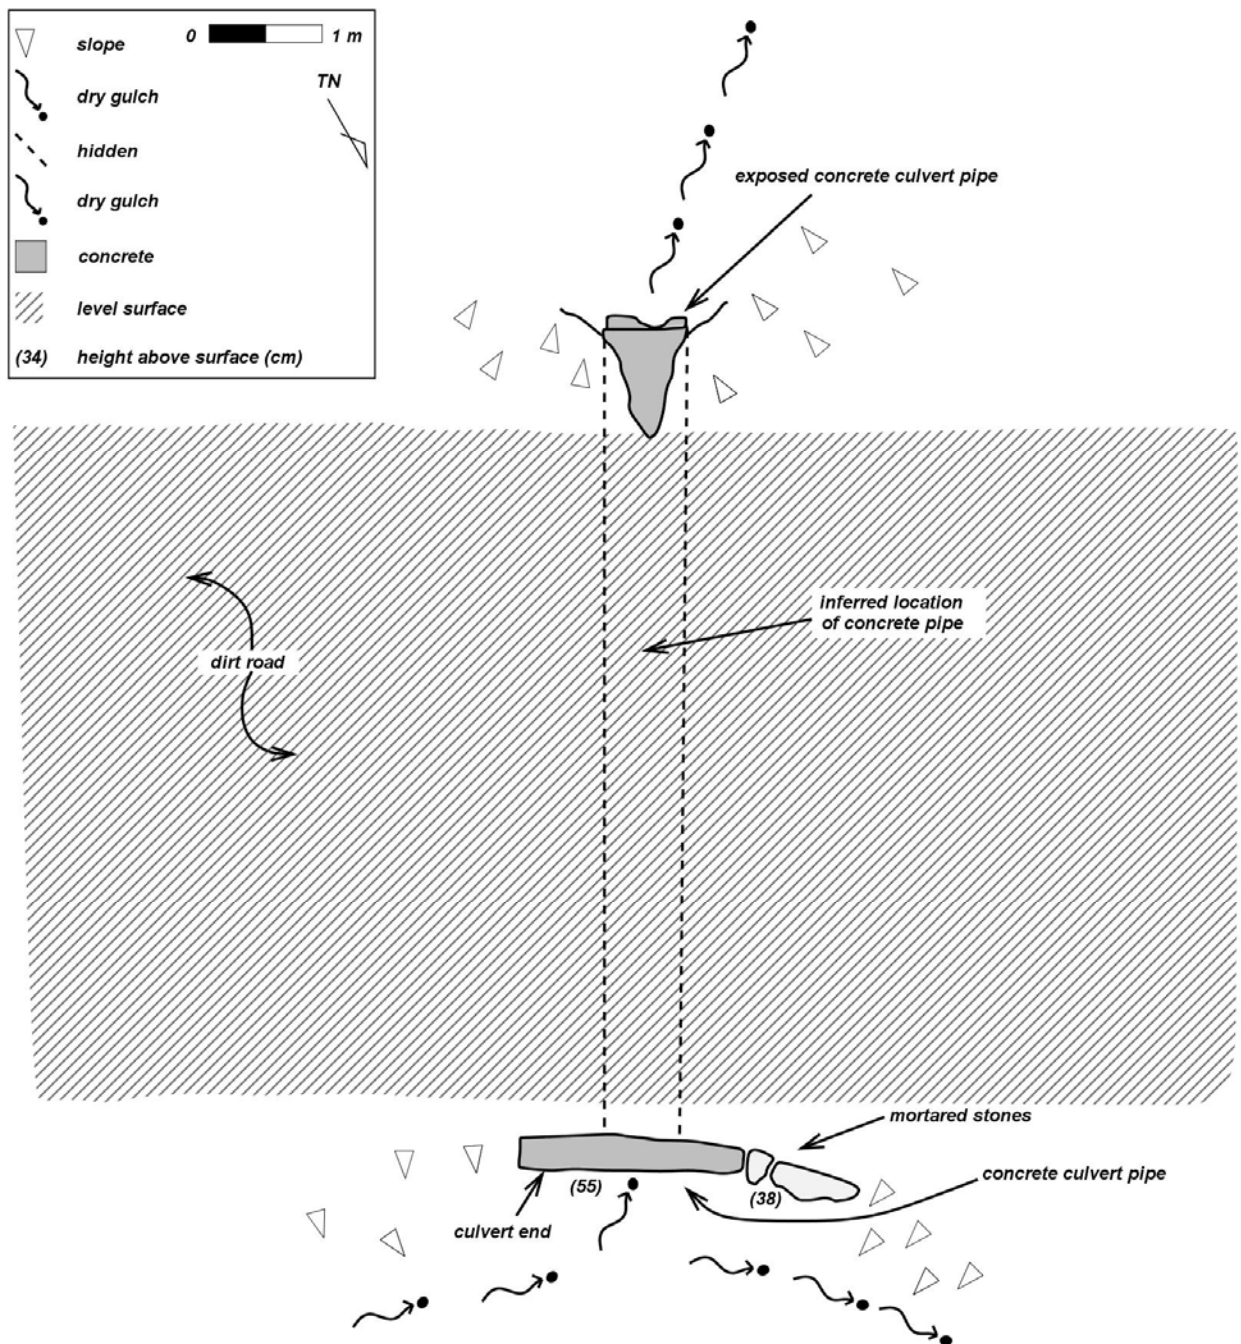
SIHP 50-60-01-02585 culvert, plan view drawing.
